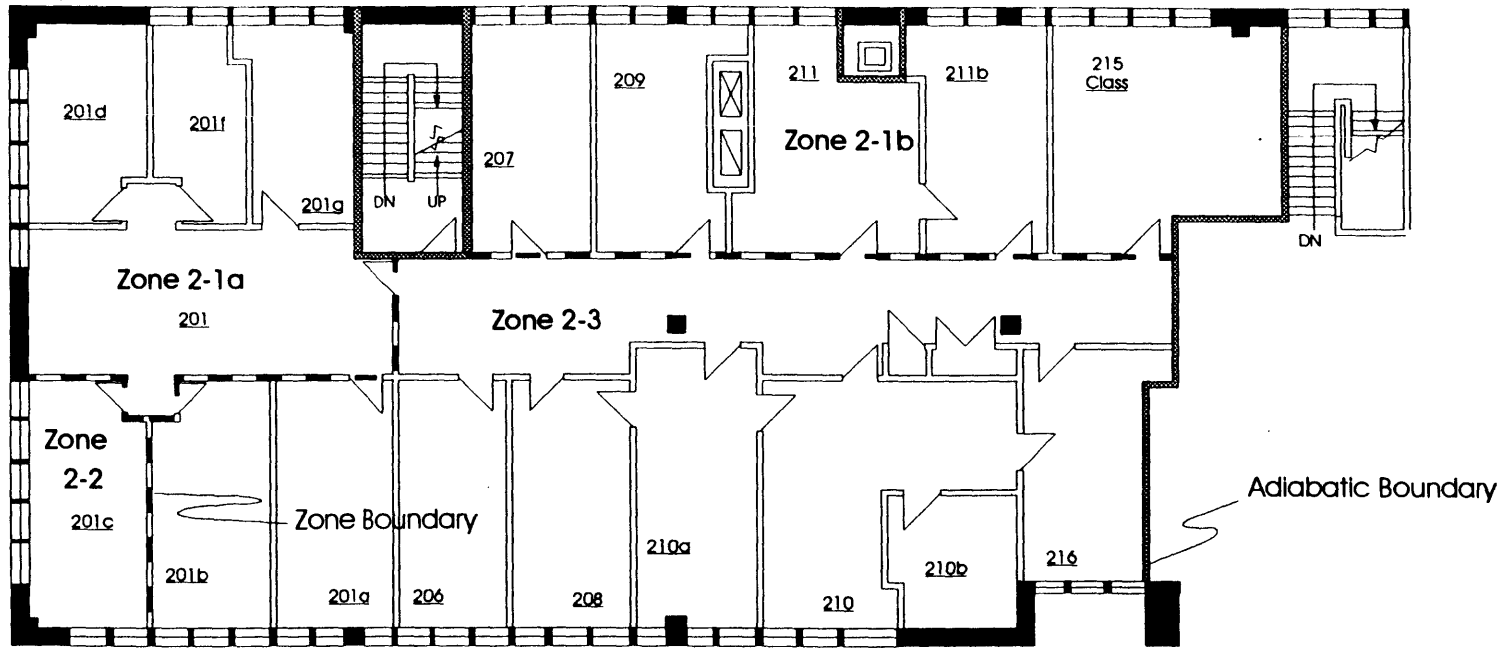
Building E51 - Second Floor Level Zoning Option 2D
